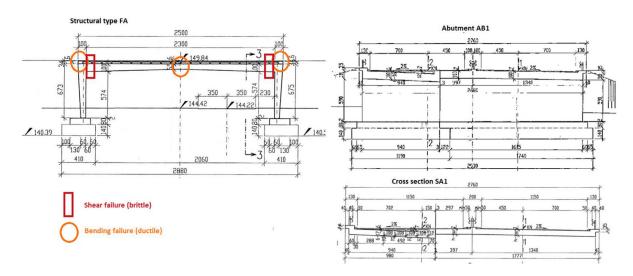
The bridge cross section and longitudinal section with labelled vulnerable zones
